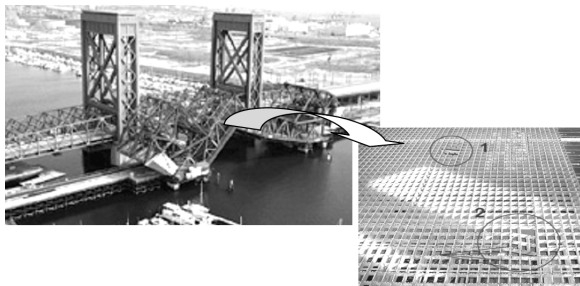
Fatigue Damages of the Lift Span of the Schuyler Heim Highway Steel Bridge
